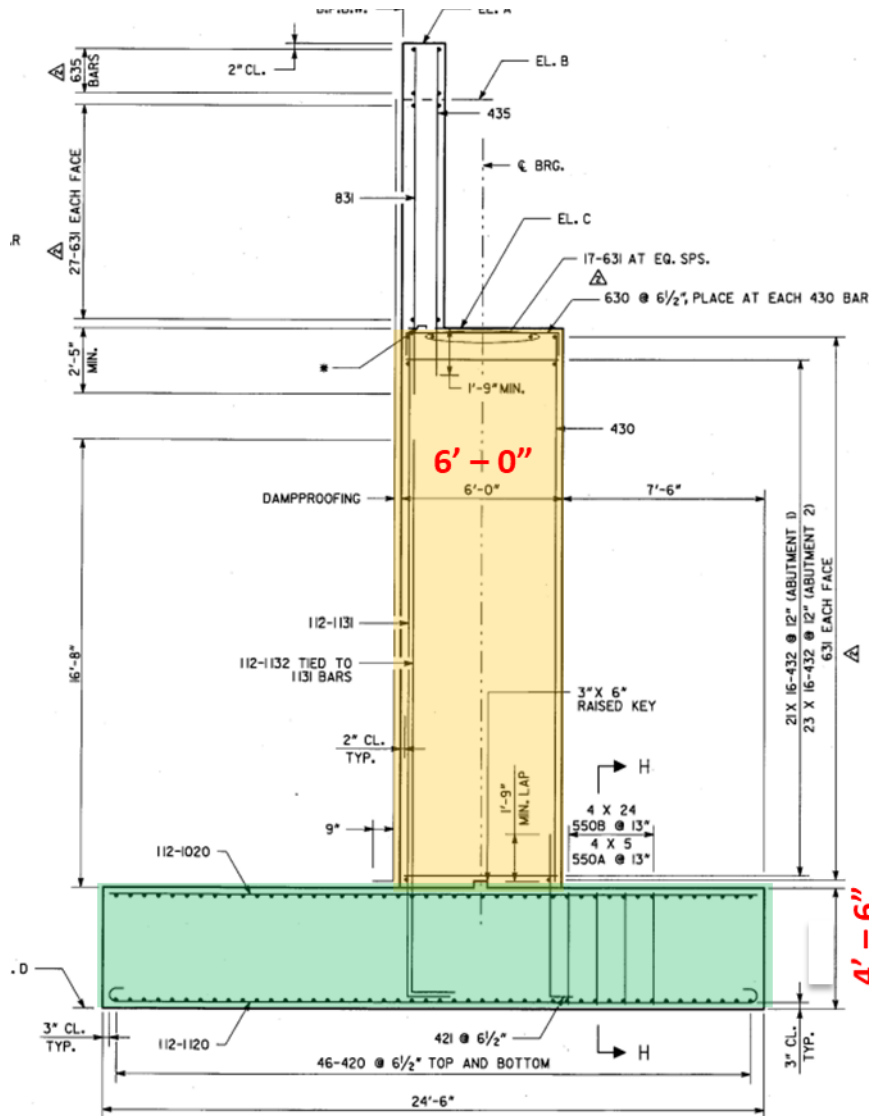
Illustration. Cross-section view of abutment and foundation of SR-92 bridge.
